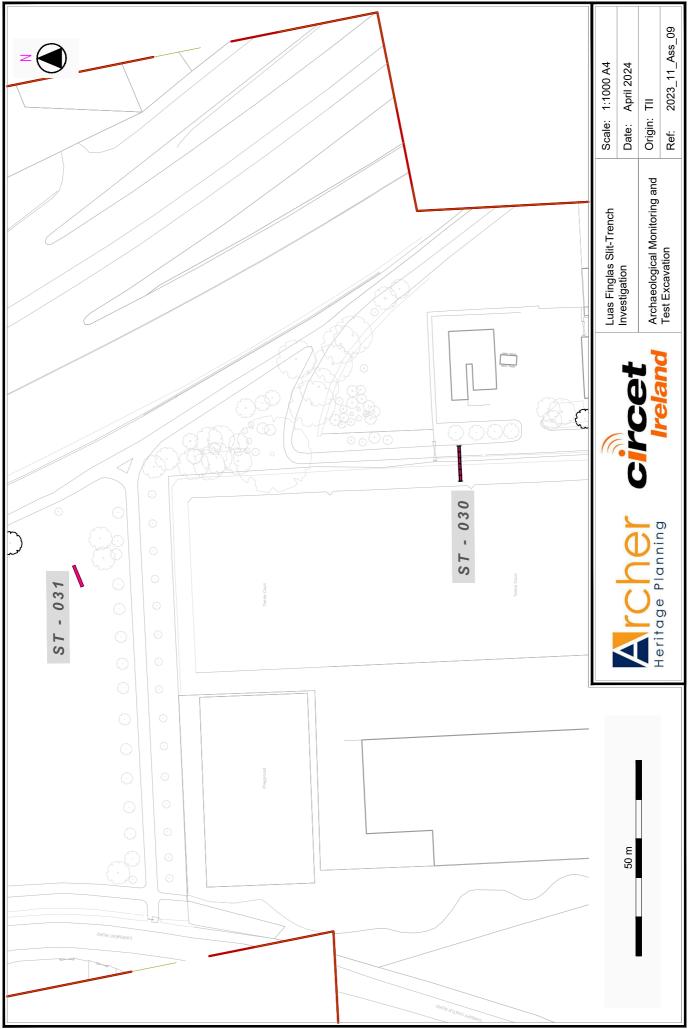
Detailed Utility Slit Trench Location Plan (vii)
